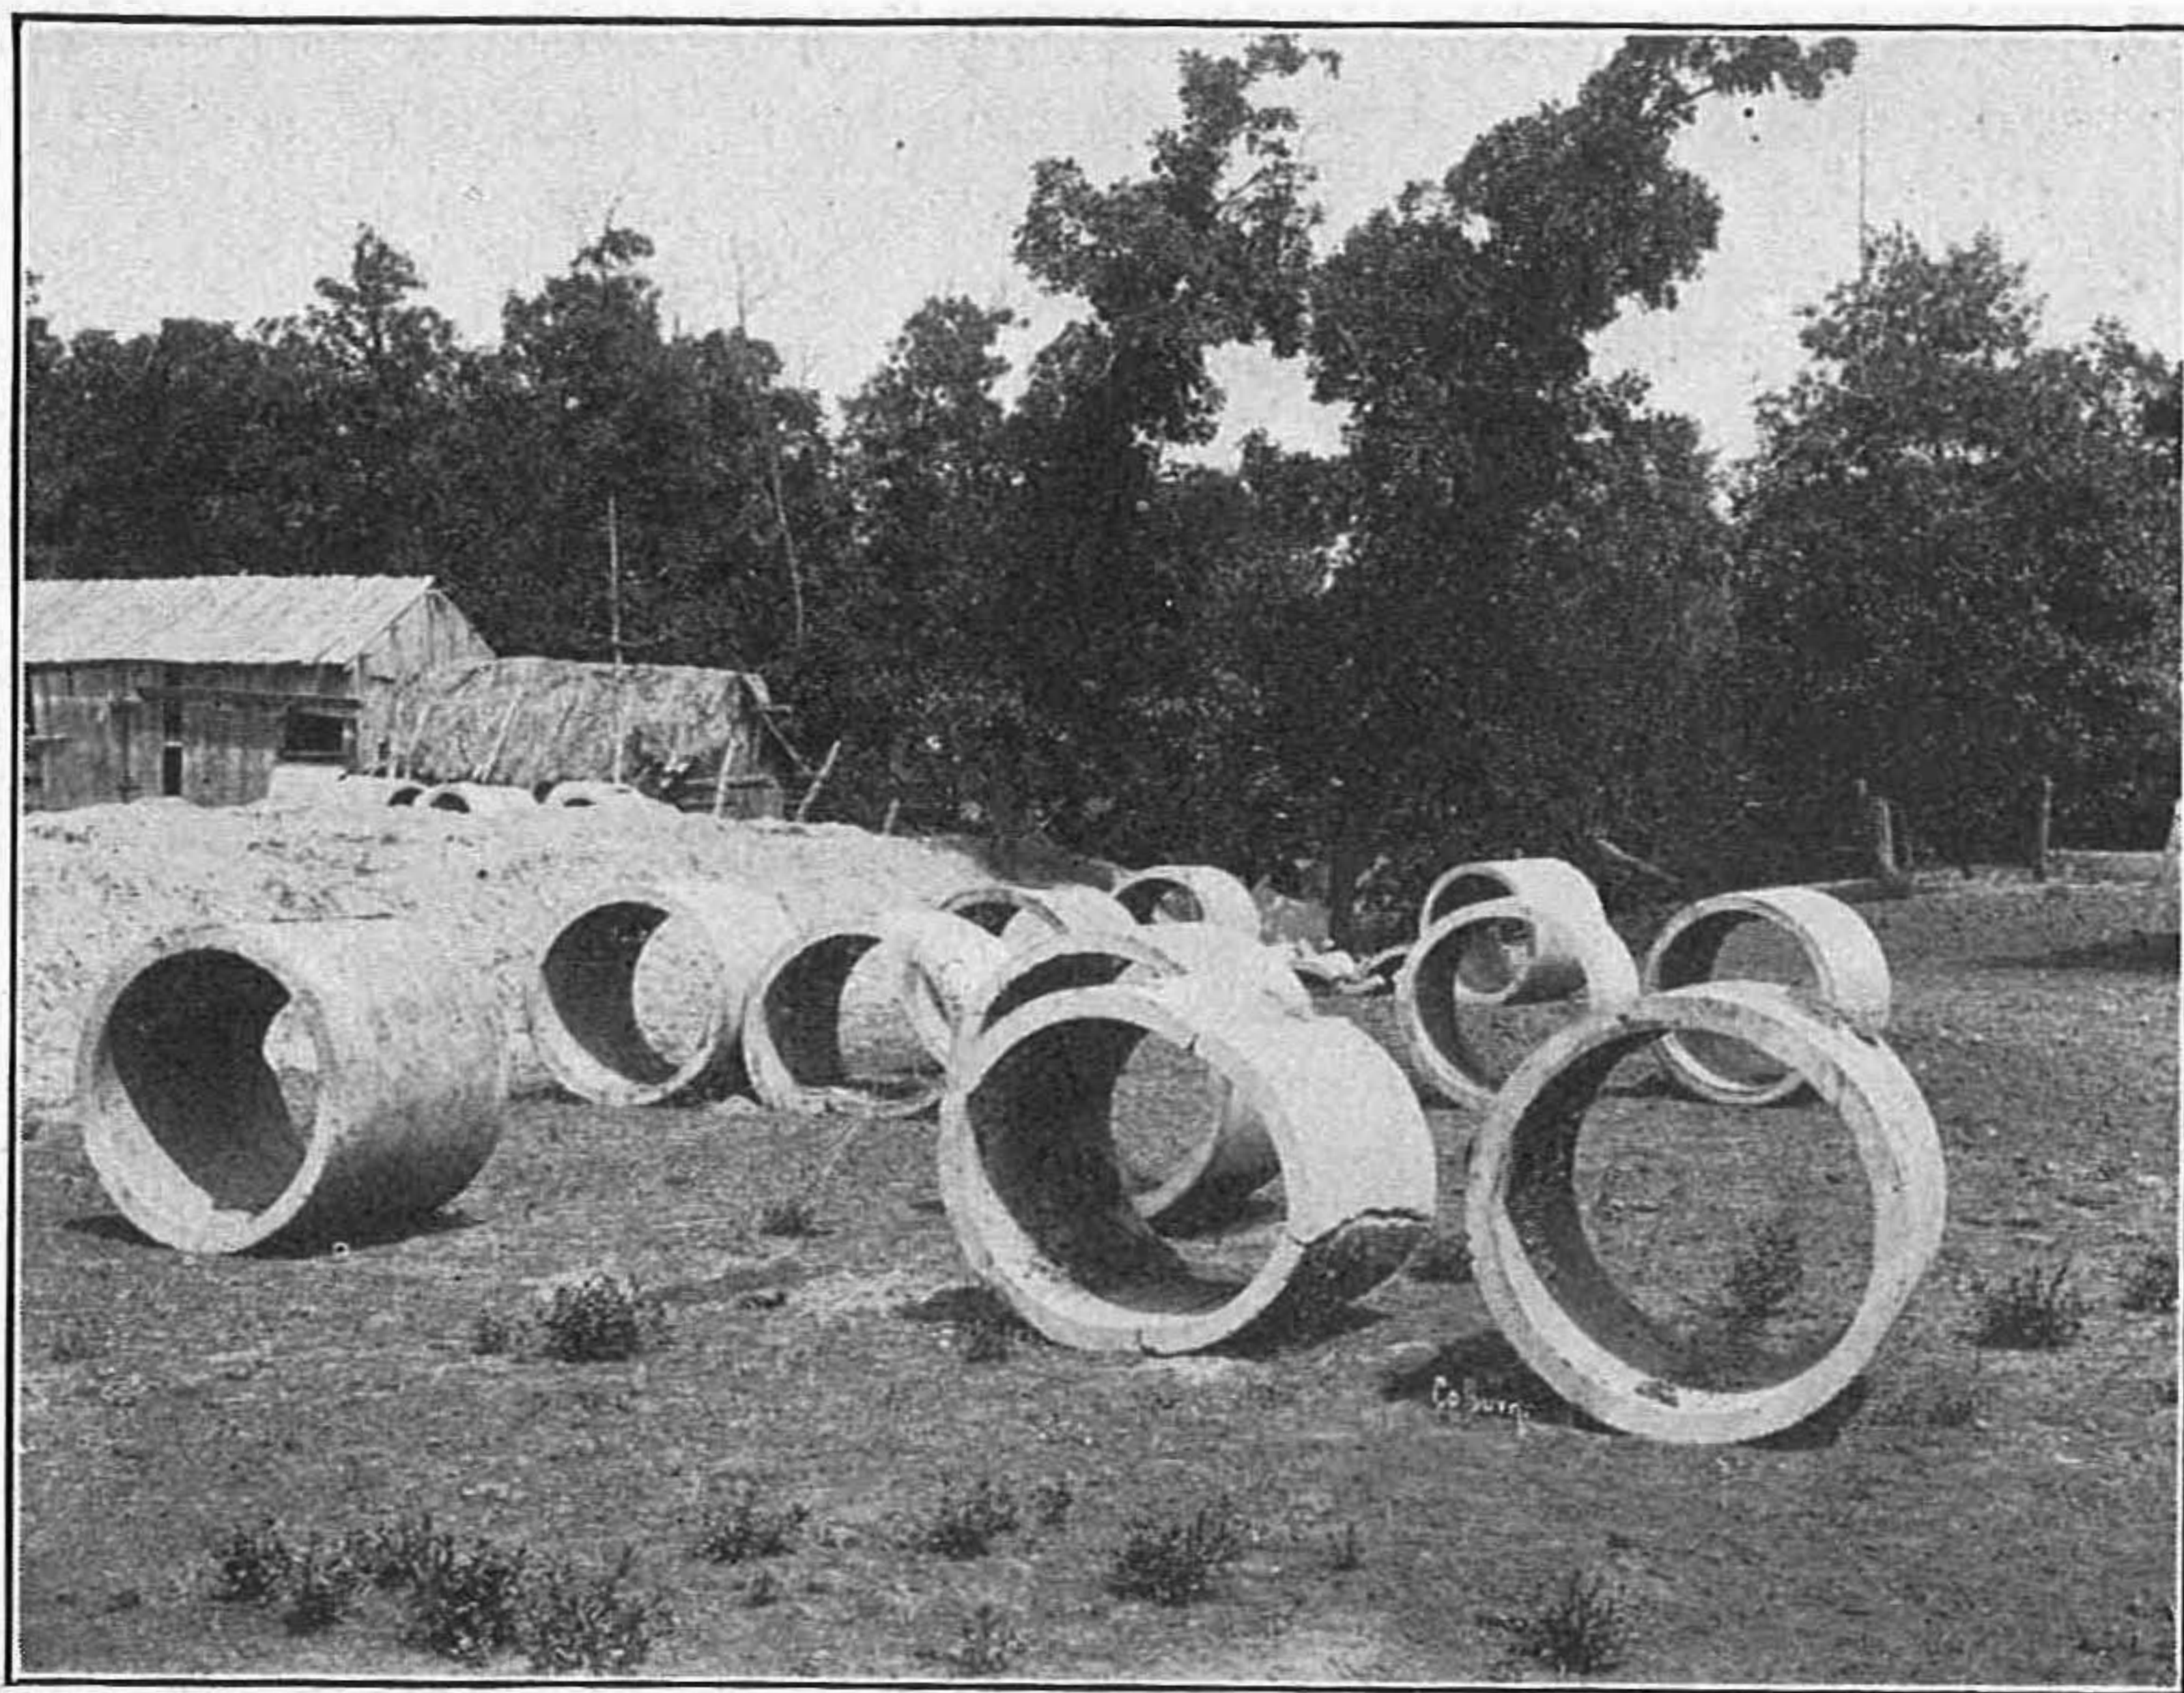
View of Cracked 36 Inch Drain Tile from Ditch in Drainage District No. 48, Boone County, Iowa.
